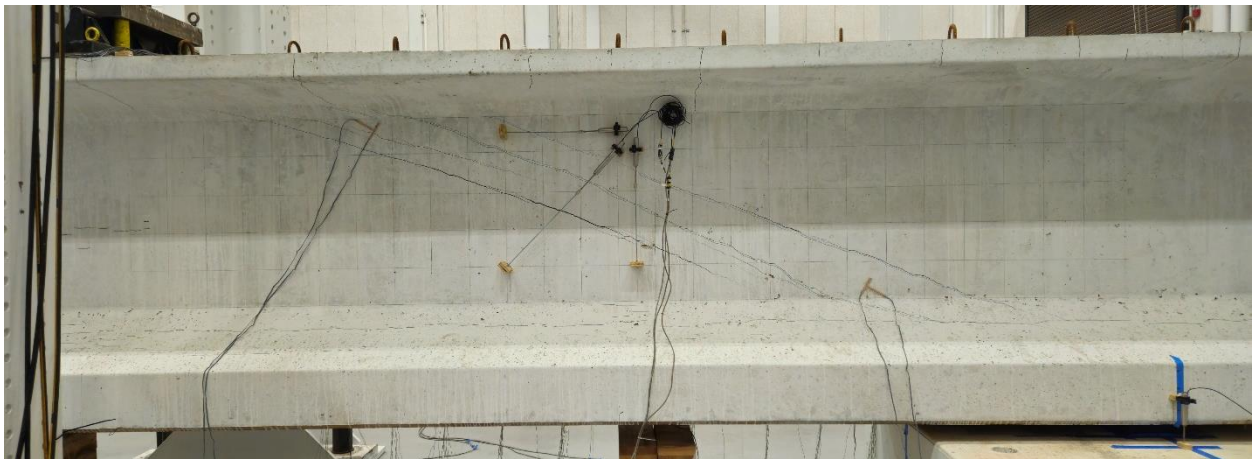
East side of G8 girder at cracking load.
